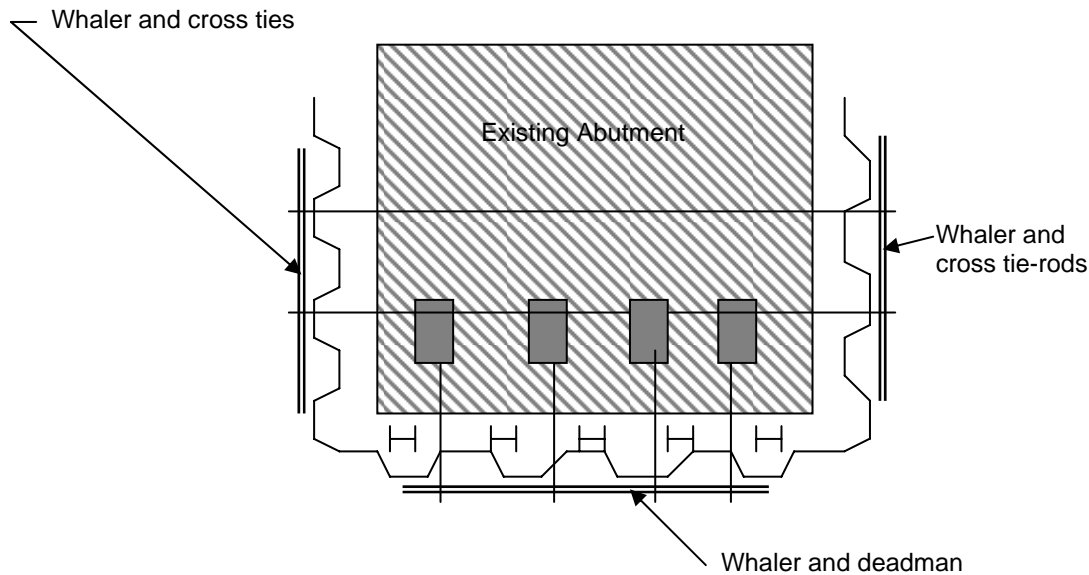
Preliminary Cross-tie and Anchored Deadman Configuration
